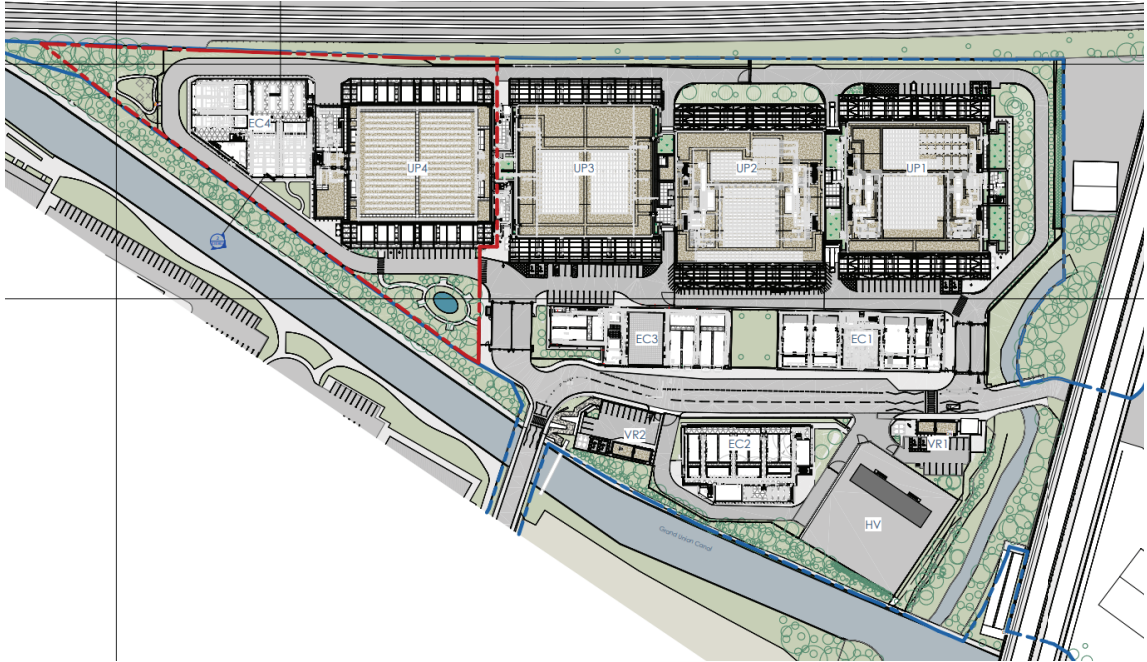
Proposed Site Plan (please note – a larger version of plan can be found in the Committee Plan Pack)
